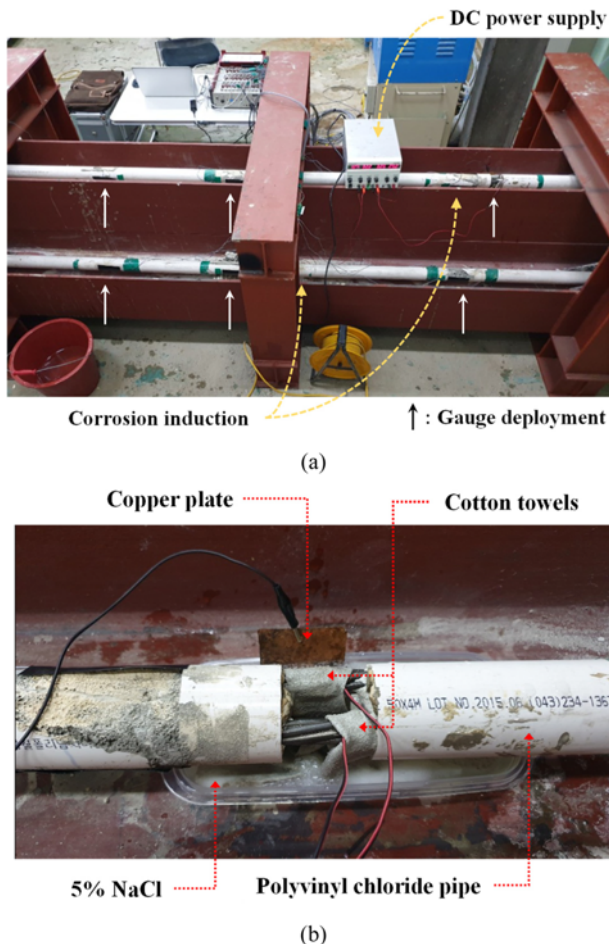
Test Setup: (a) Gauge Deployments, (b) Corrosion Acceleration of Strands
